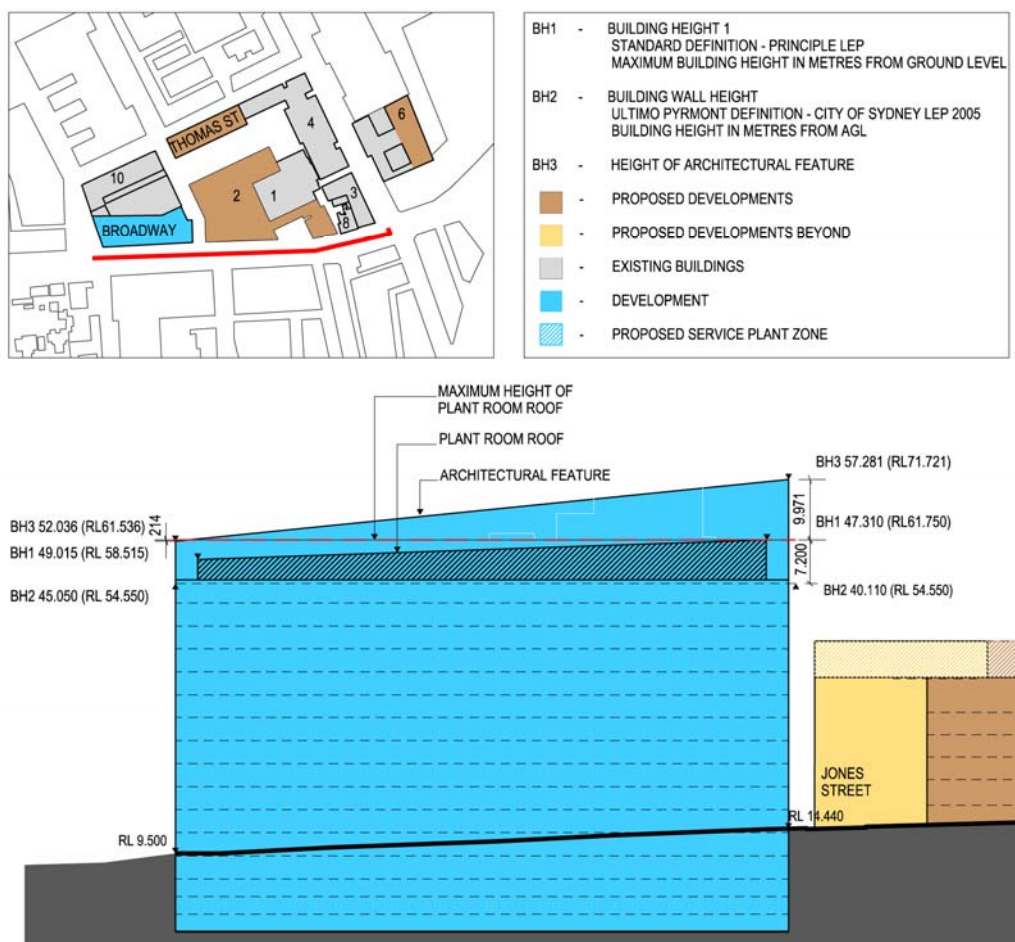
Screening of roof plant (Broadway elevation) (Source: DCM)
